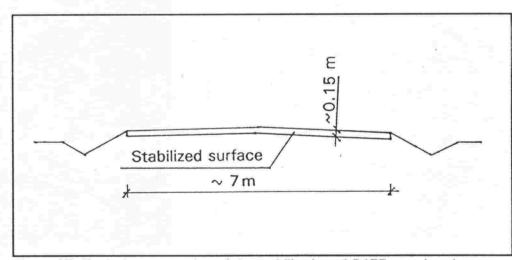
Typical cross-section of the stabilized road D177 near Lusaka, Zambia.
